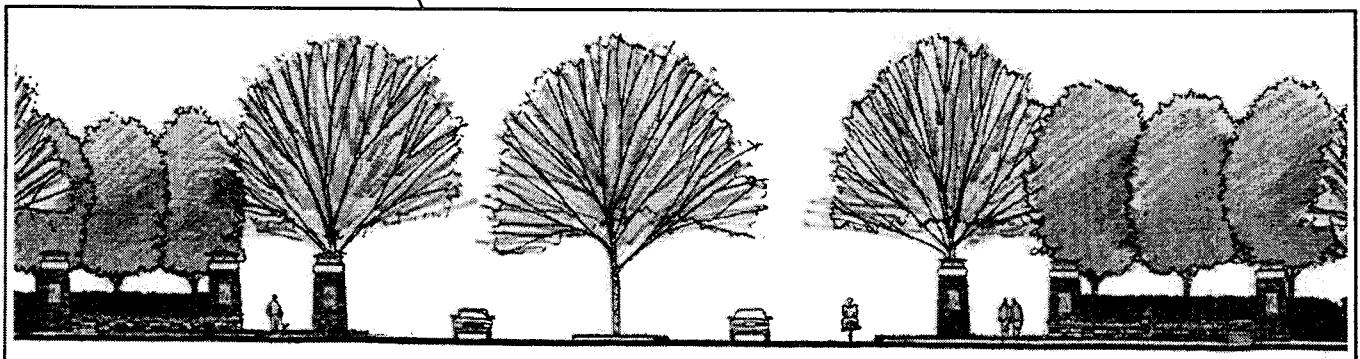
Major Neighborhood Entry Concept in Fiddymment Ranch - Looking West on Blue Oaks Boulevard
